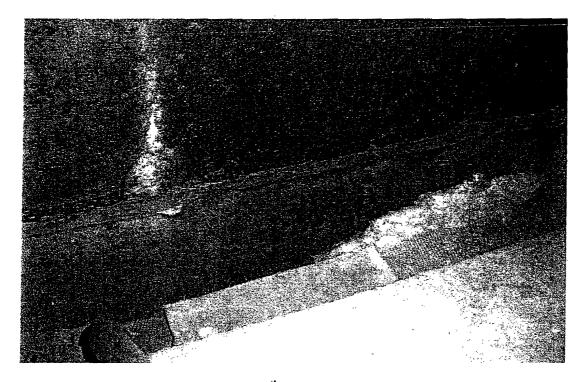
11<sup>th</sup> Floor Outer Ring. Condensation and frosting are shown on the precast walls in the 11<sup>th</sup> Floor Outer Ring, on January 18, 2007.
